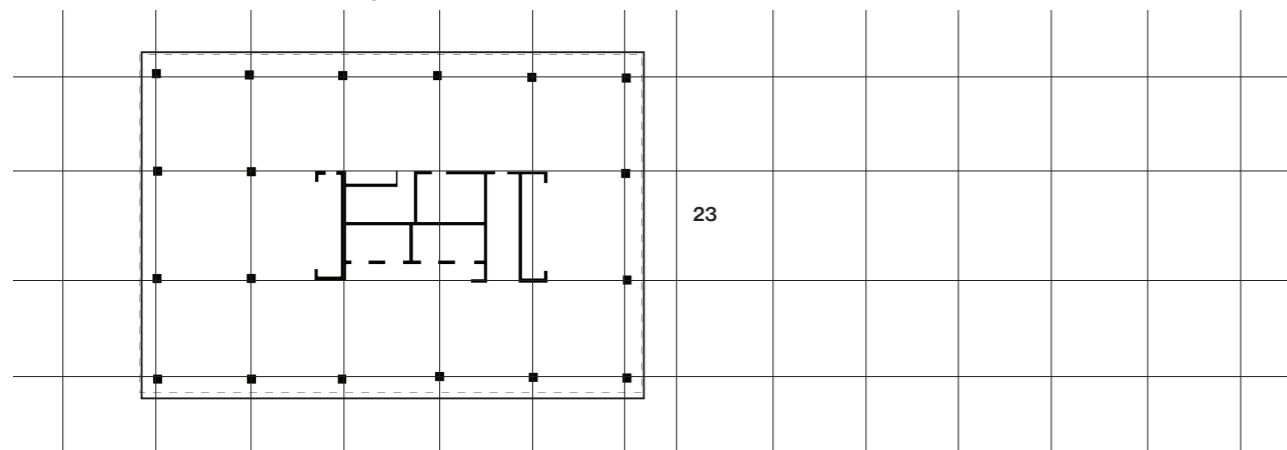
THE SITUATION OF THE EXPOSED CONCRETE STRUCTURE OF THE TOWER
